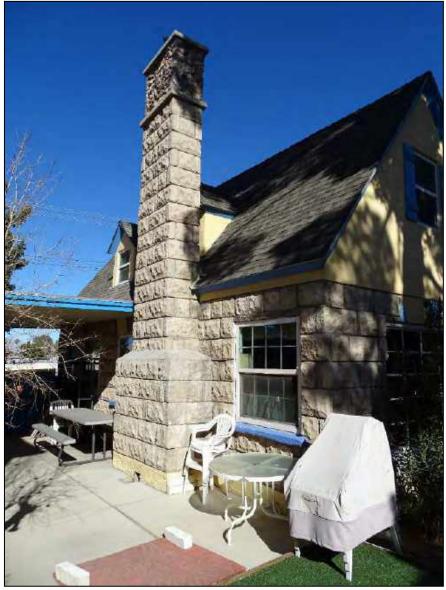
West facade of Christensen House, showing porch and chimney, facing southeast.
